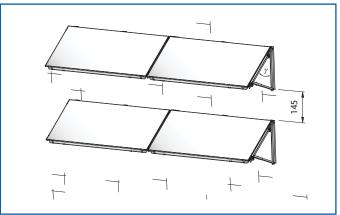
Shade-free spacing for several rows of wall installation kits for landscape flat-plate collectors arranged above each other. Logasol SKN3.0-w and SKS4.0-w; dimensions in inches
